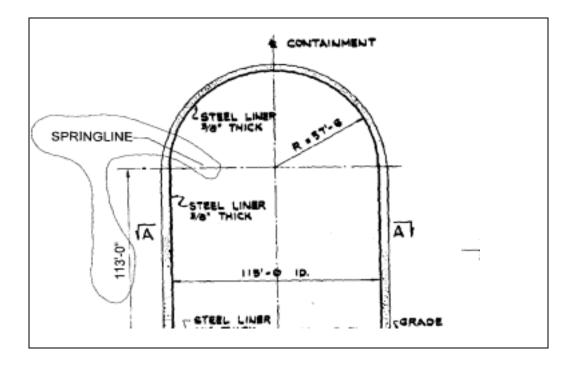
CNP Containment Sectional Elevation (UFSAR Figure 5.2.2-3)
